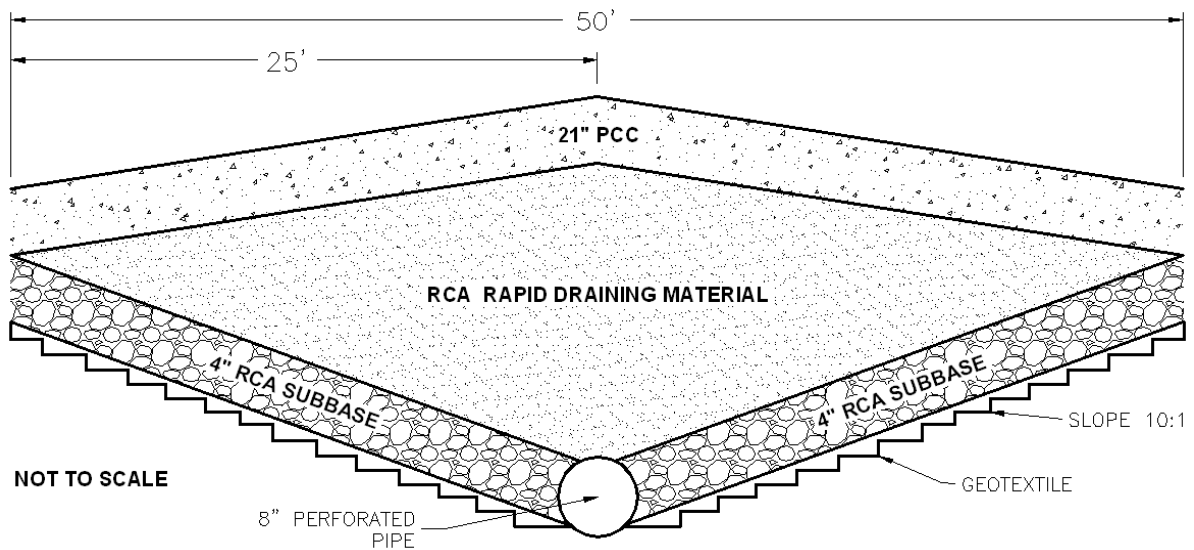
Pavement detail of the typical keel section containing RCA.
